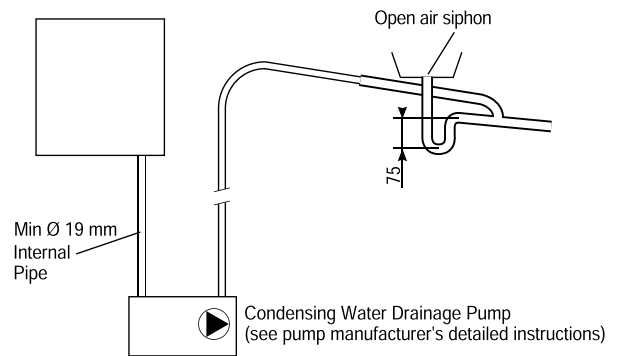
Connection of a Condensate Drainage Pipe to an Interior Drainage and Ventilation Pipe
